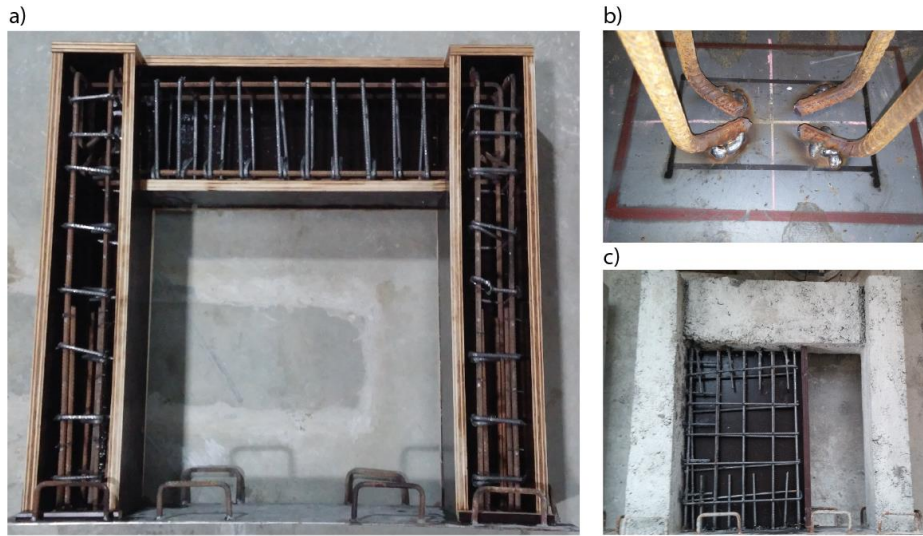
a) Formwork and steel reinforcement installation b) Connection of steel base-plate anchors and steel reinforcement of the infill panel
